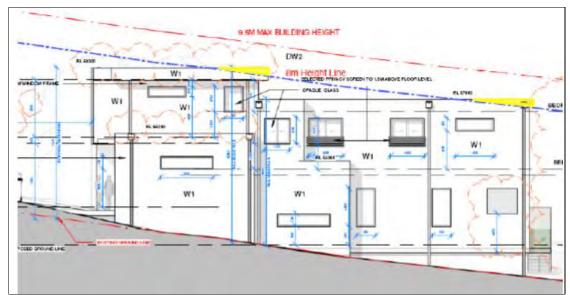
North-western elevation showing the portions of the building exceeding the 8m wall plate height in yellow.
